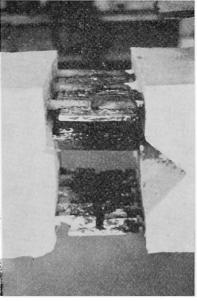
Jointing of reinforcing bars, using steel plates lying under the bars.
